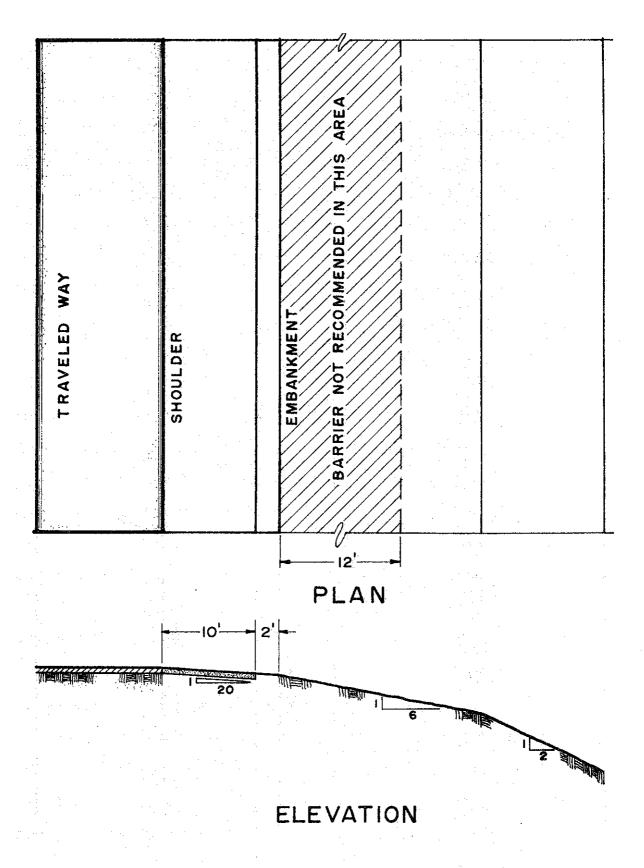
Roadside Barrier Location on Typical Barn Top Section.
